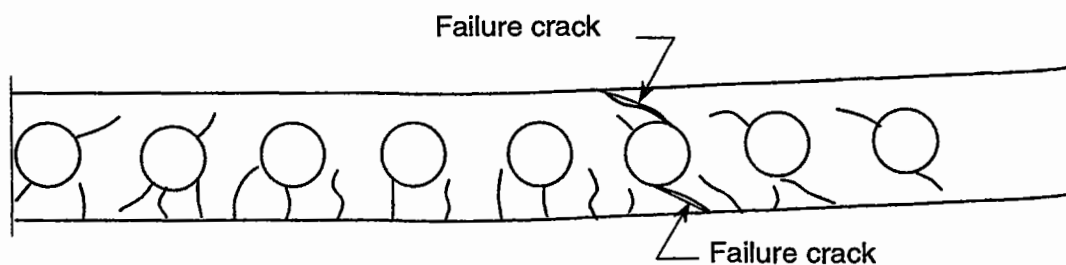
Shear failure of Beam B4 at the throat section (Salam, 1977).
